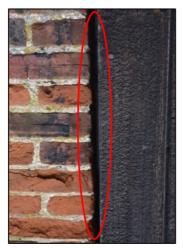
Feature between the door frame and wall where a common pipistrelle was noted roosting on the west elevation of Barn C – external
